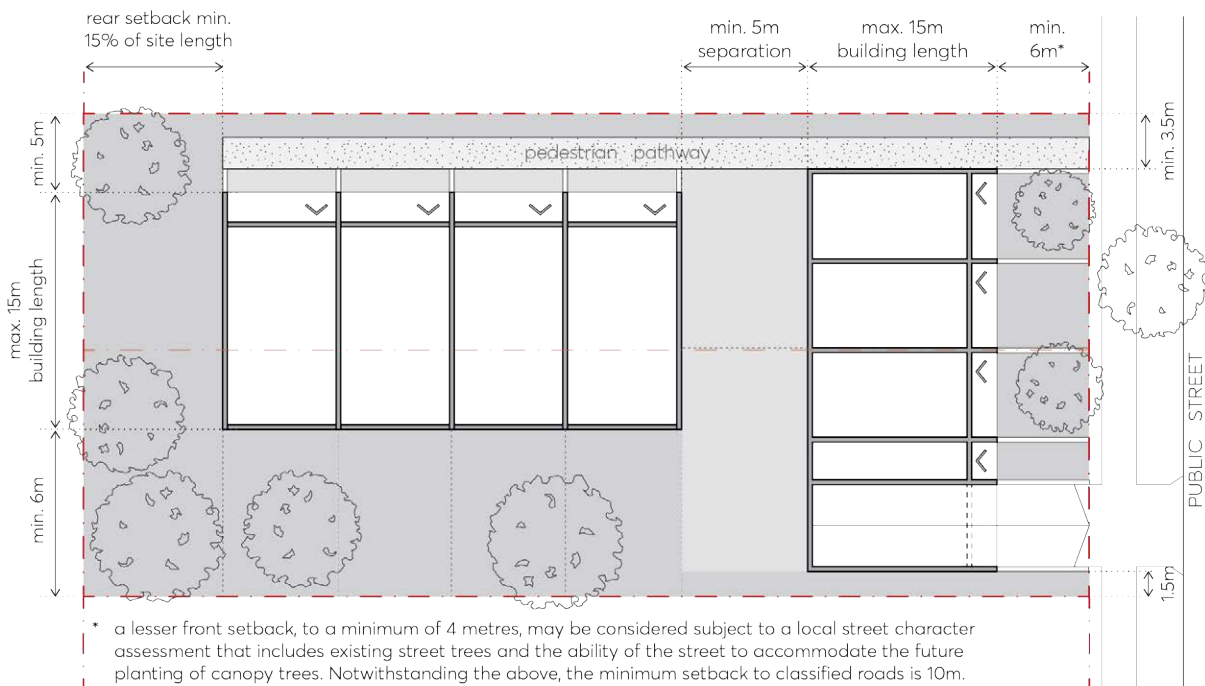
Townhouses L-Configuration Setbacks and Separation
